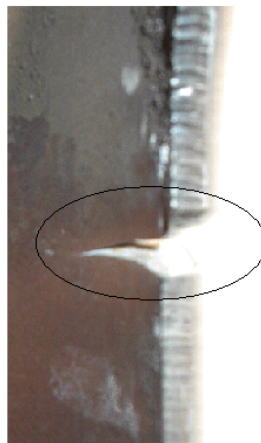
Monotonic Tension, Fracture Failure Close View from Inside.
